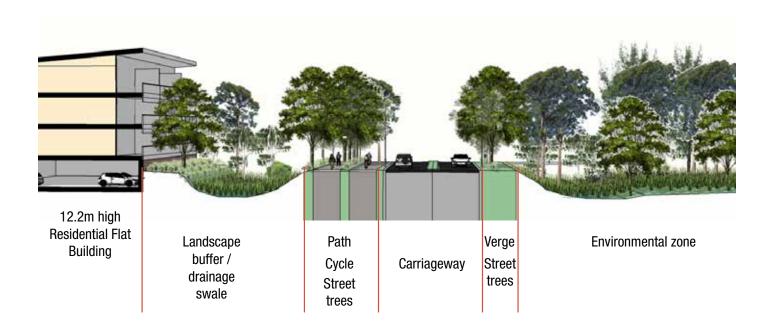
Indicative Turnock Street (West) Extension Section
